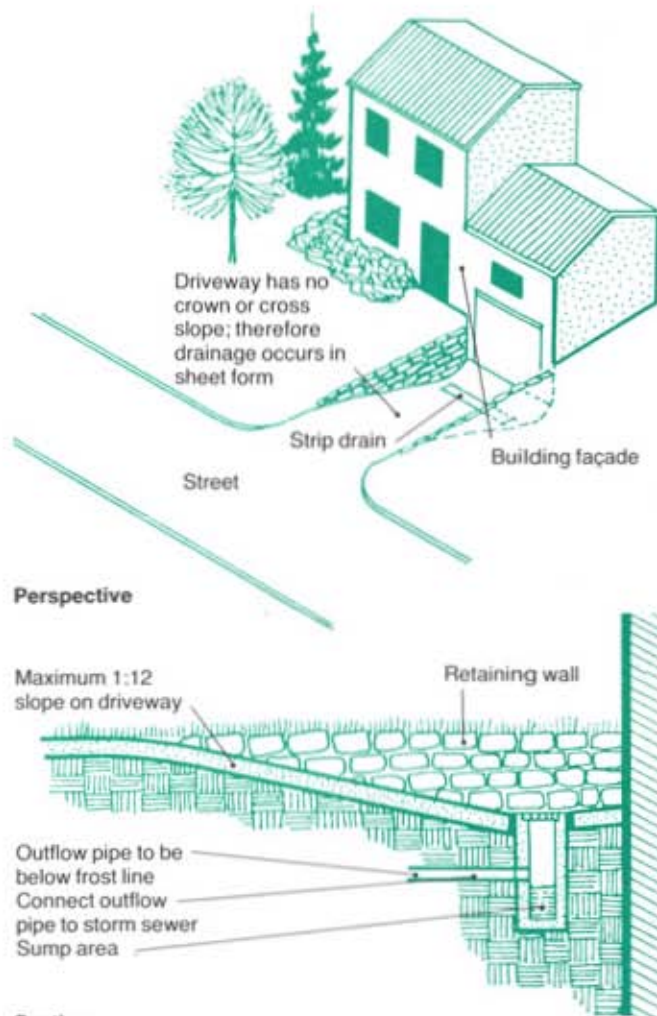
Strip drains allow surface run-off to be collected in a "sheet" fashion. It should be noted that a driveway such as this, which slopes down towards a garage, is not recommended because of safety, flooding and maintenance problems.
